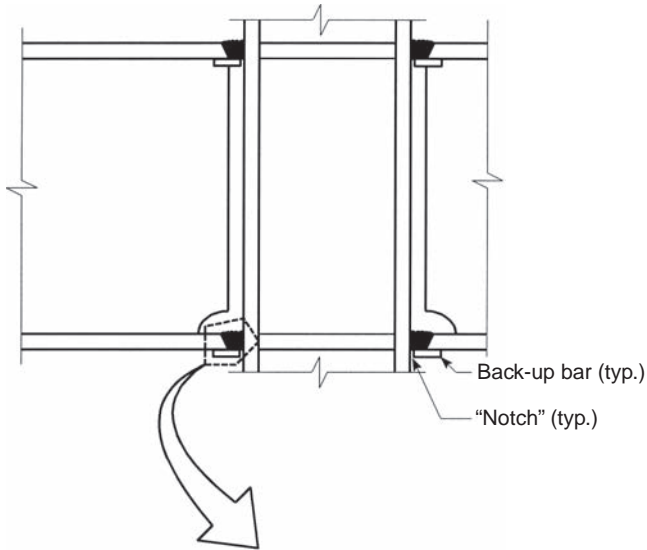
Example of fractured beam bottom flange in which a crack originated at the unwelded gap between the edge of the backup bar and the column flange. (Courtesy of J. E. Patridge, Smith-Emery Co., Los Angeles.)
